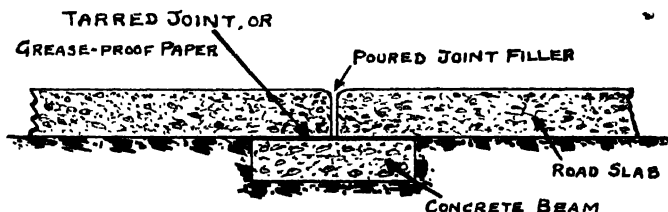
CONCRETE BEARER, OR BEAM BELOW A JOINT
